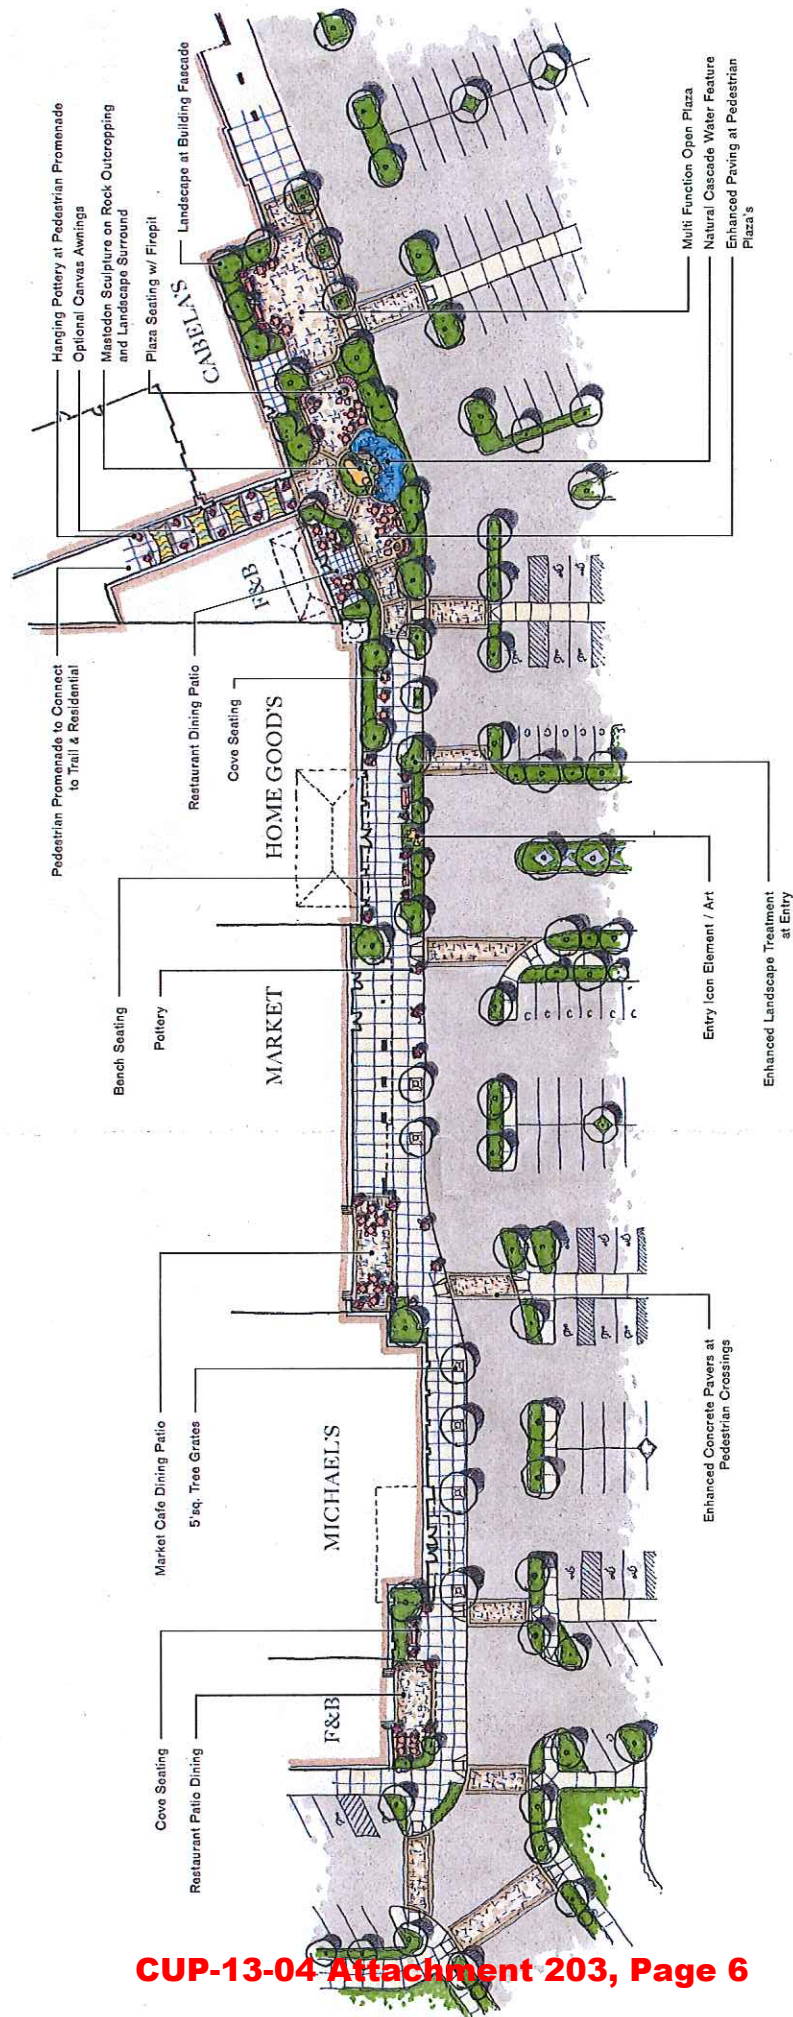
BUILDING FRONTAGE LANDSCAPE PLAN
